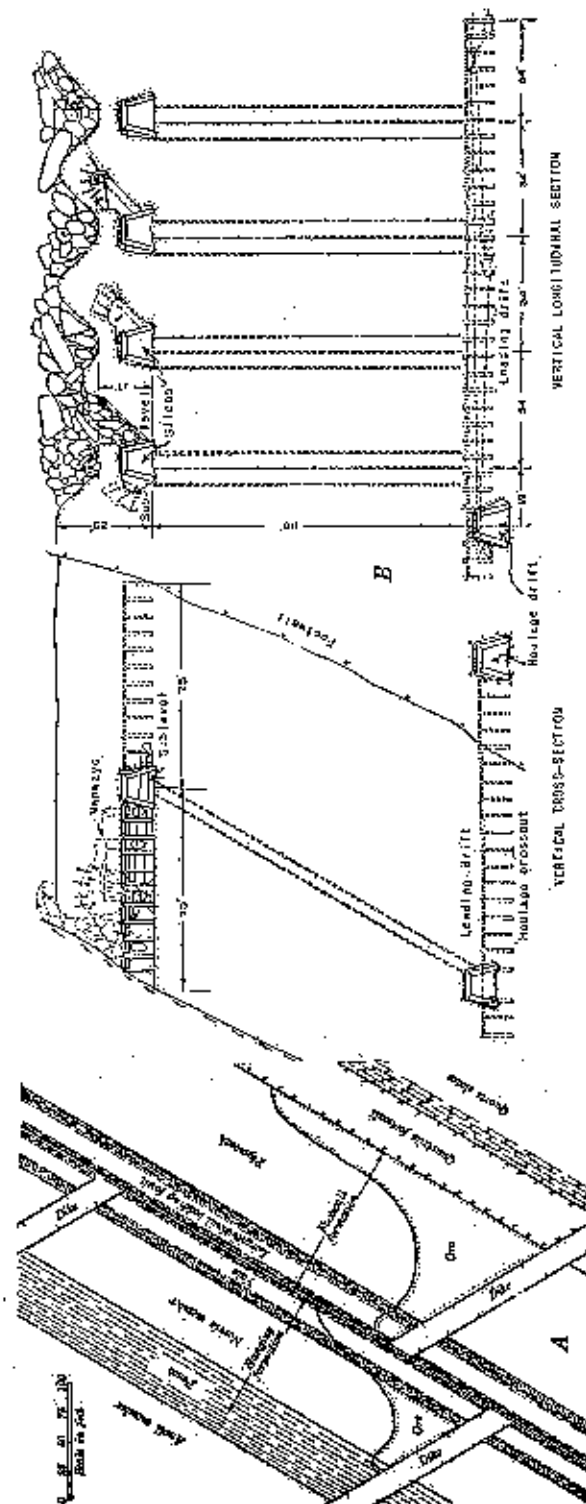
Sublevel caving, Montreat mine, Wisconsin: A, ideal cross section of formations; B, method of developing, slicing, and caving.
